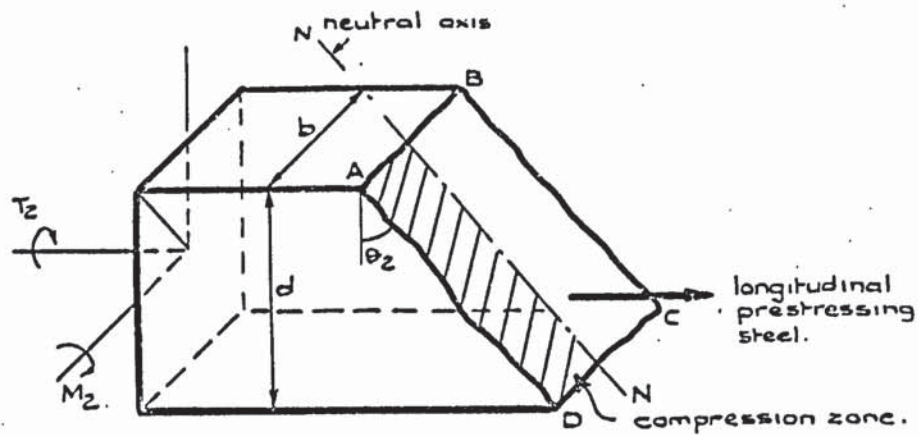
Mode 2. type of failure in prestressed concrete. (rectangular failure plane)
